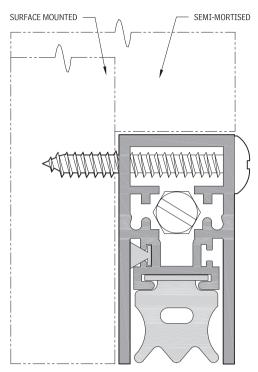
Surface-Mounted Automatic Door Bottom (Source: Courtesy of Pemko Manufacturing Company)
